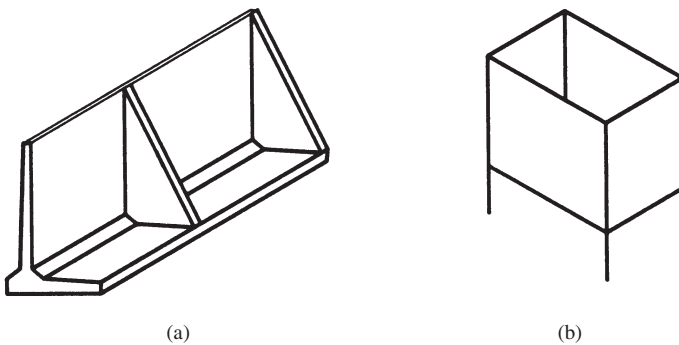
(a) Counterfort retaining wall. (b) Hopper structure
